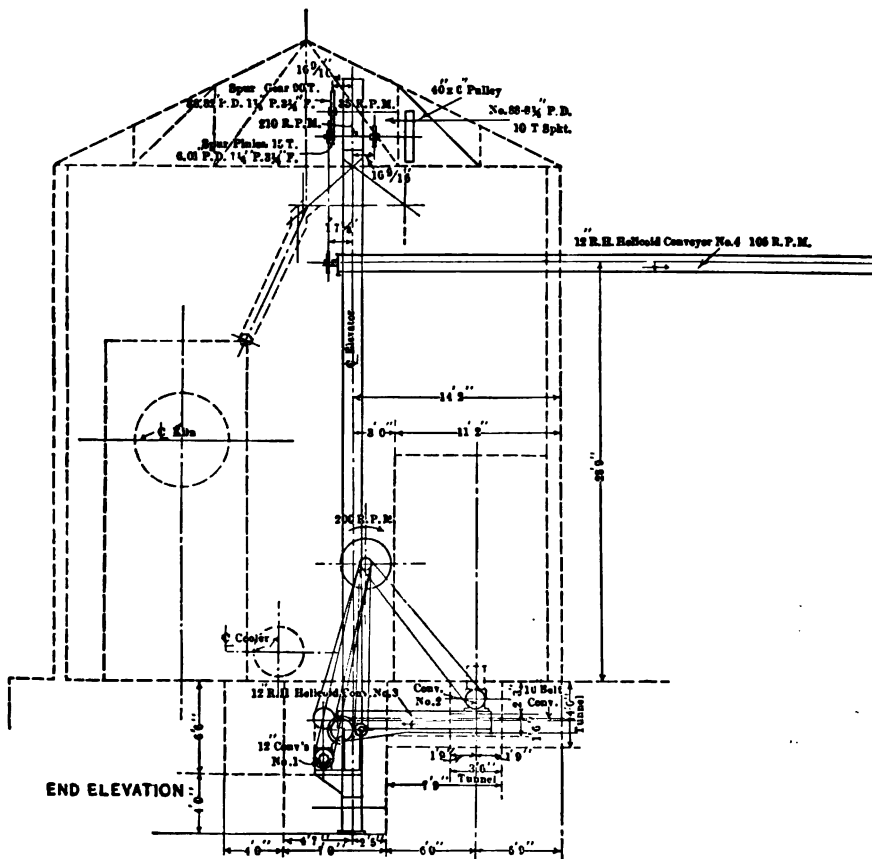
Plan and elevation of elevator and helicoid conveyor for handling fuller's earth.
